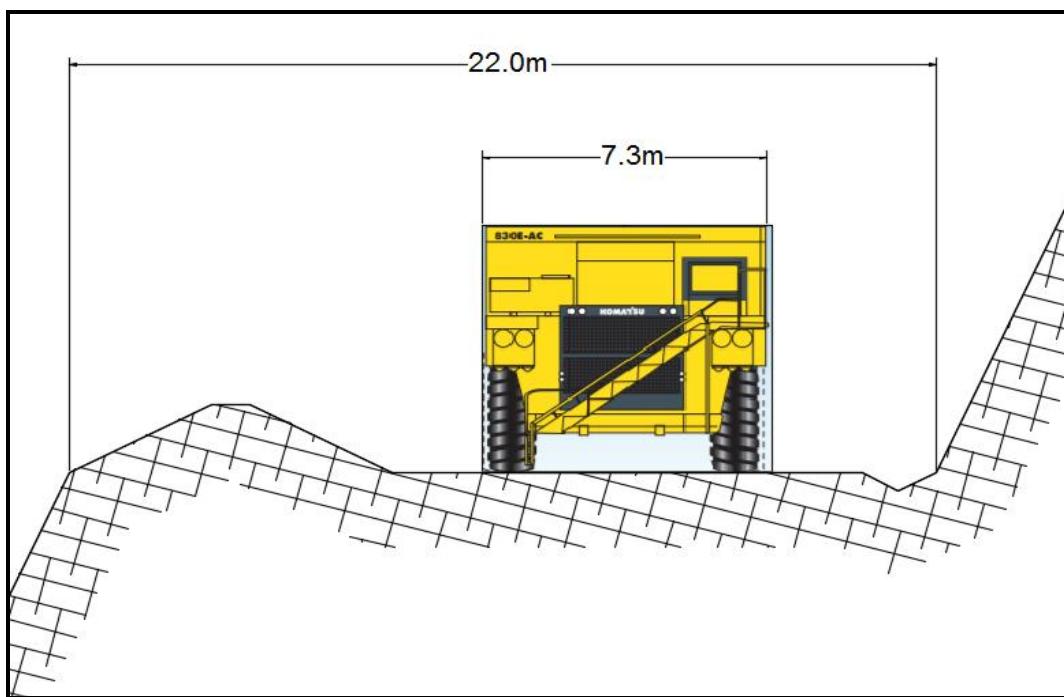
Six Lane Haul Road, Used for Pit Bottom Access Only
